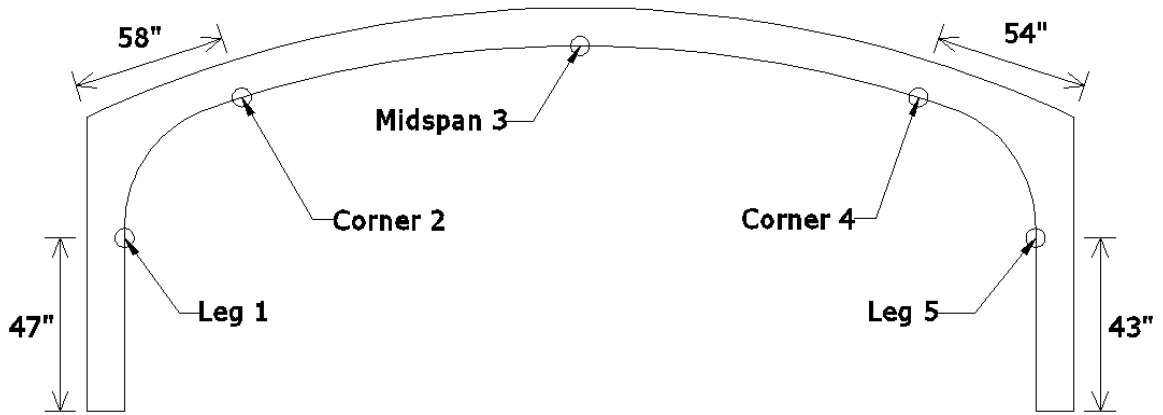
Gauge Layout – 20 ft Clear Span Test Specimen
